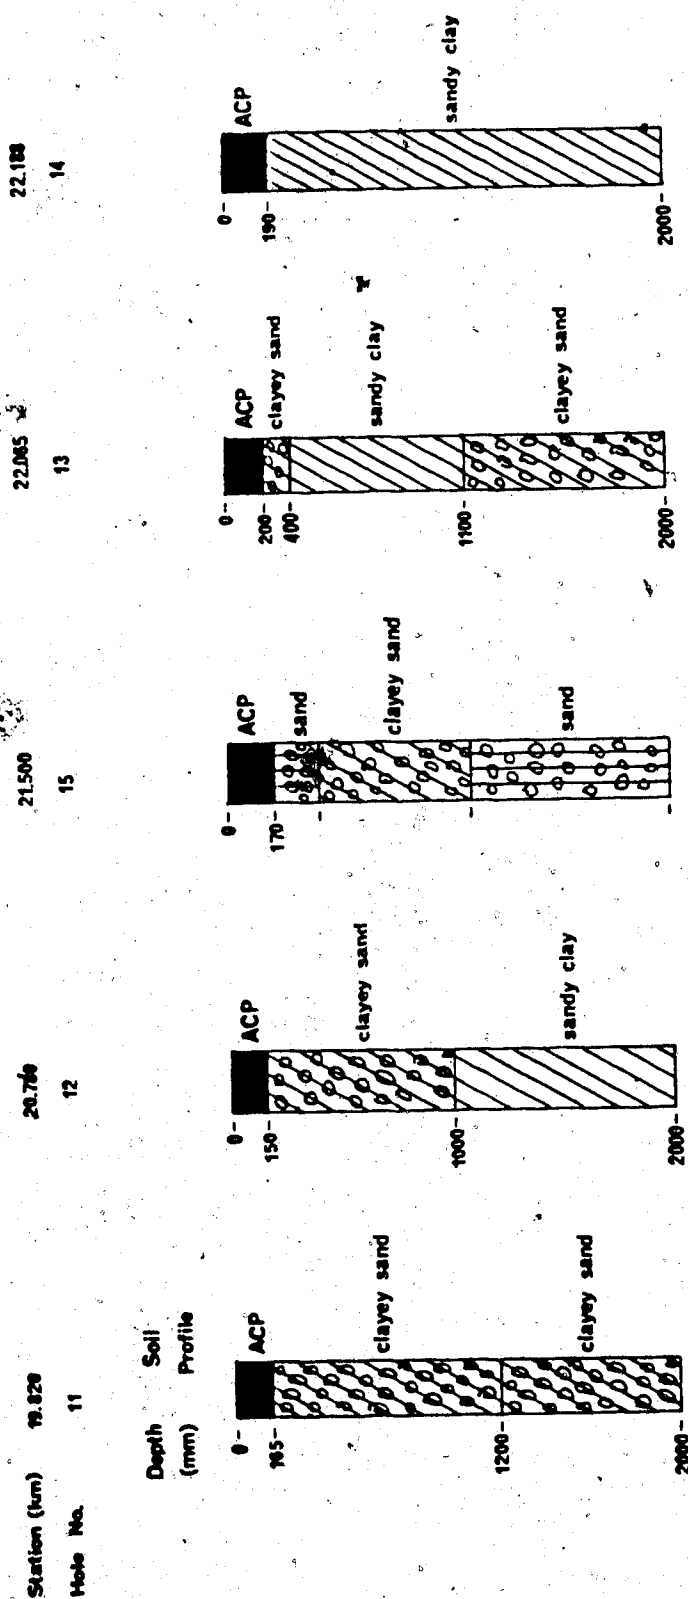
Project SR 845:02-3 (Heavy Cracking Section)
